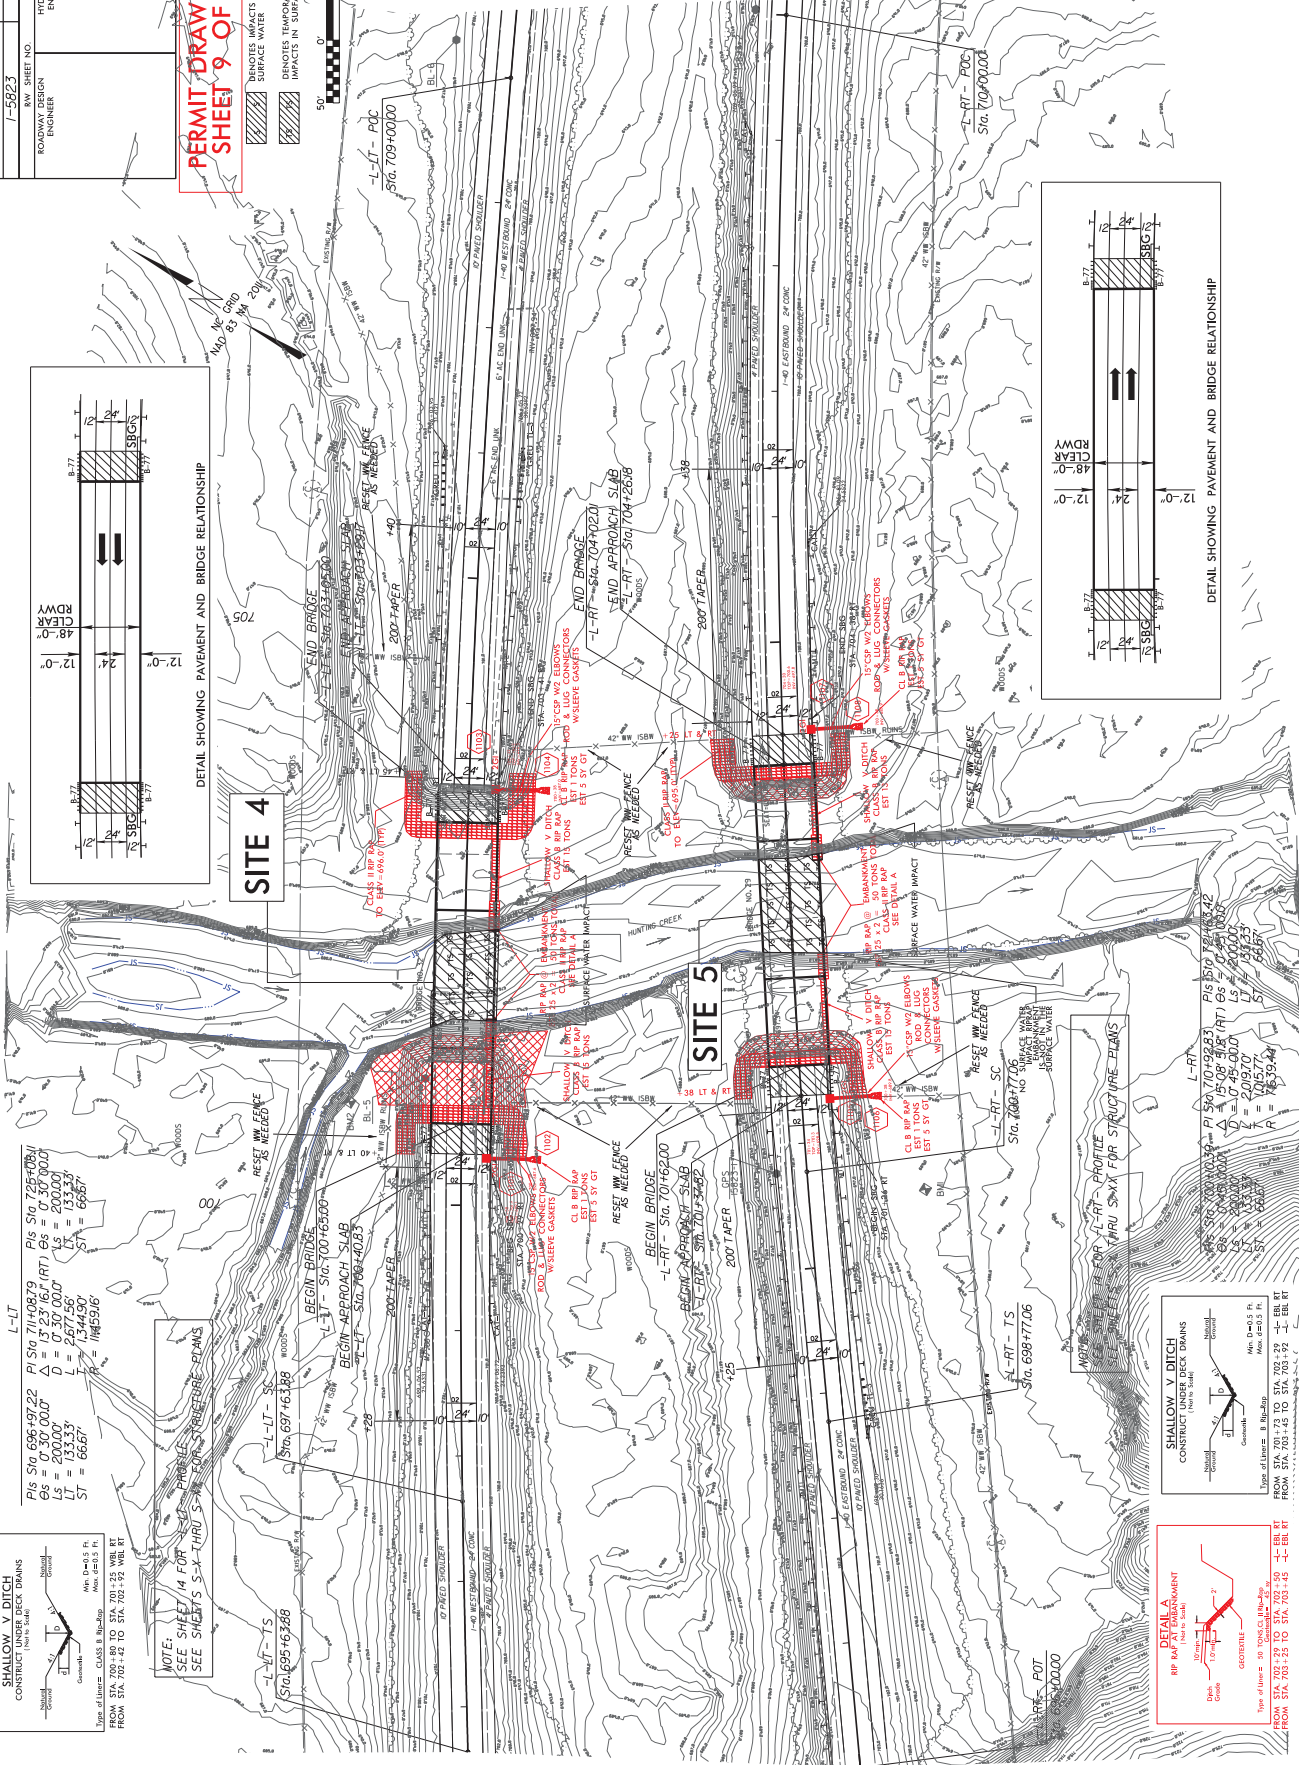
DETAIL SHOWING PAVEMENT AND BRIDGE RELATIONSHIP
